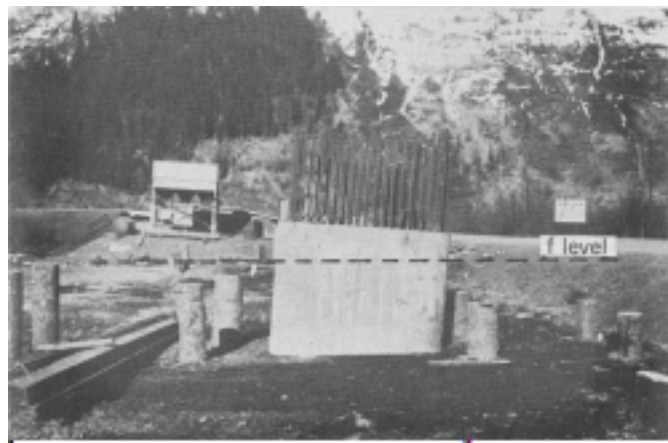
Bridge 605A, Snow River 3. During Construction. Looking East from Midspan
